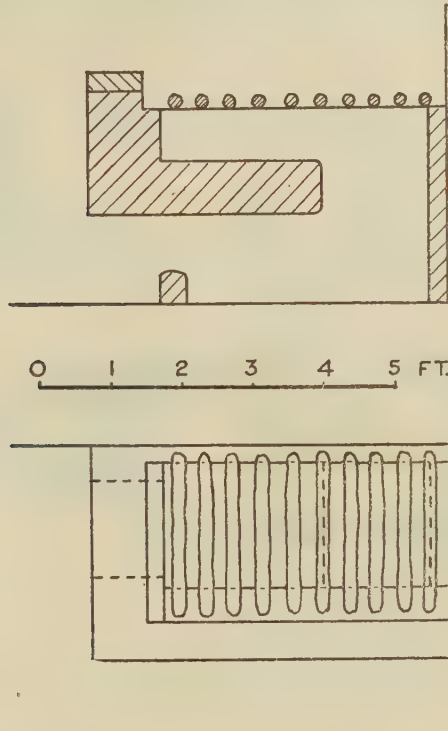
LONGITUDINAL SECTION AND PLAN
